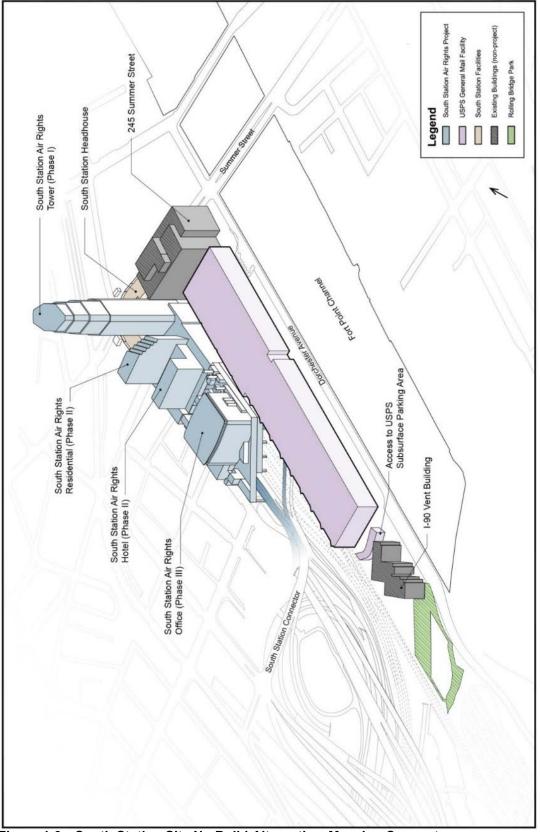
South Station Site No Build Alternative, Massing Concept
